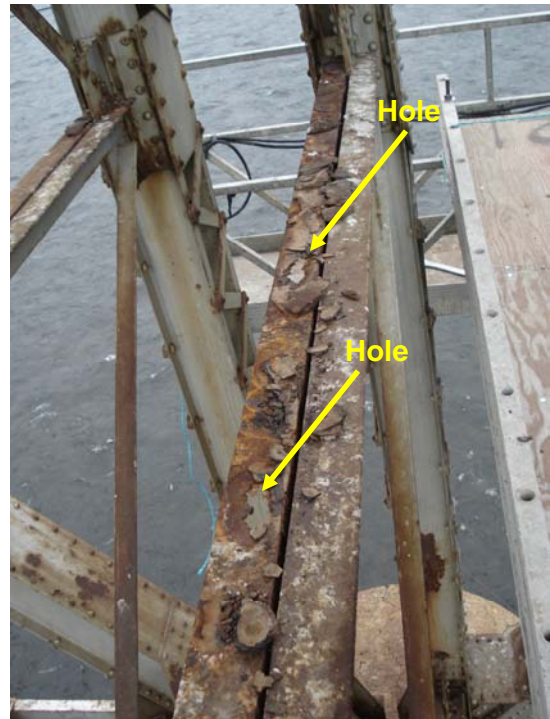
Holes in Brace Member at Panel Point 10 – Span 3
